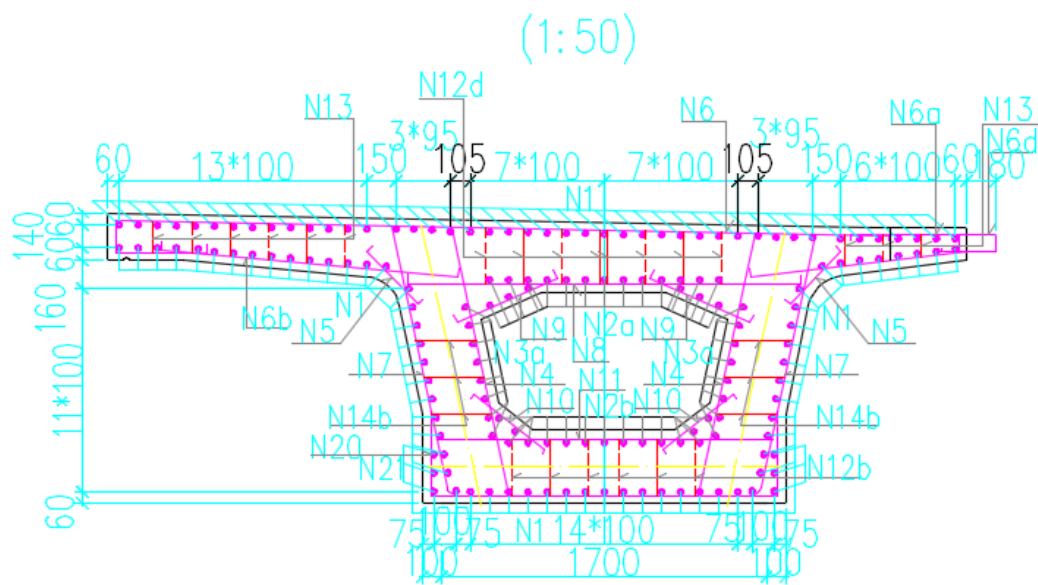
17 cross sectional view of the pre-stressed girder bridge along with reinforcement
